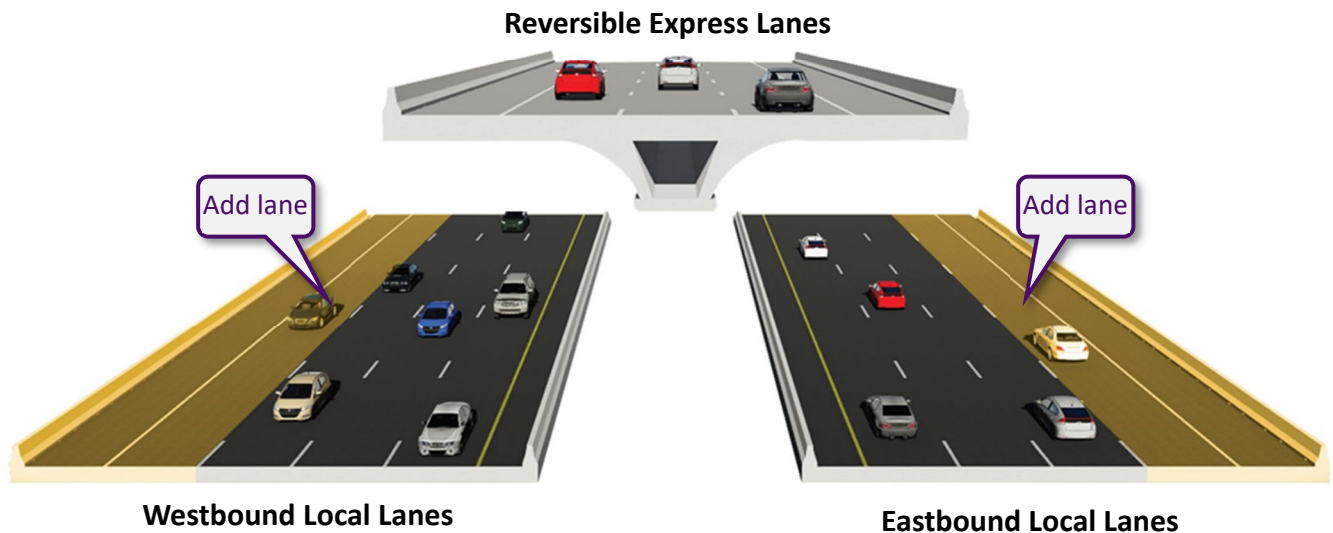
Build Alternative Typical Section (Brorein Street. to 78th Street)
